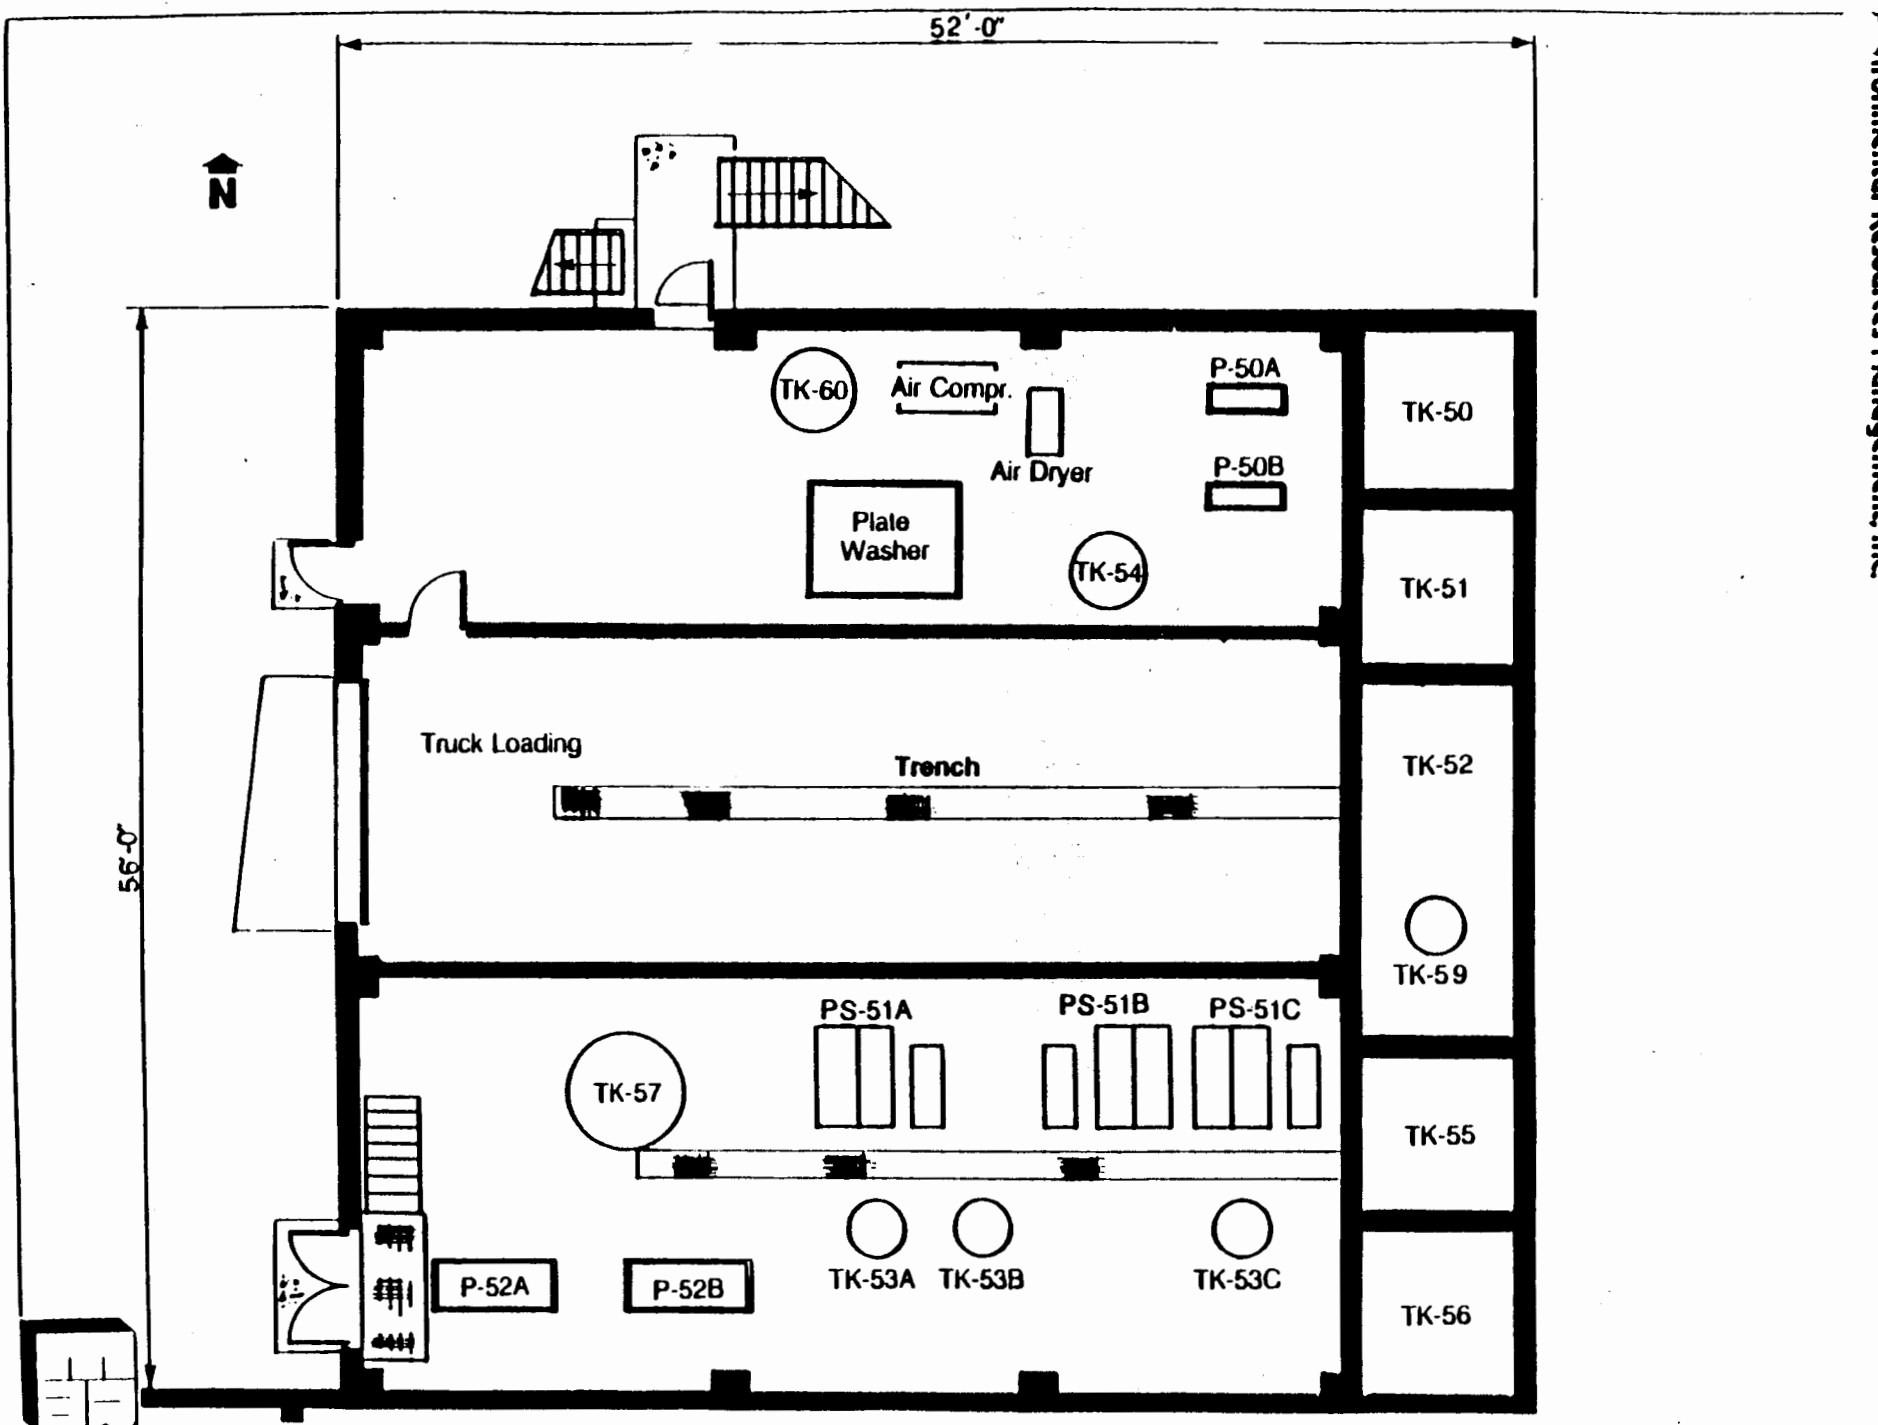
Solid Waste Facility Filter Press Building First Floor Layout Diagram
